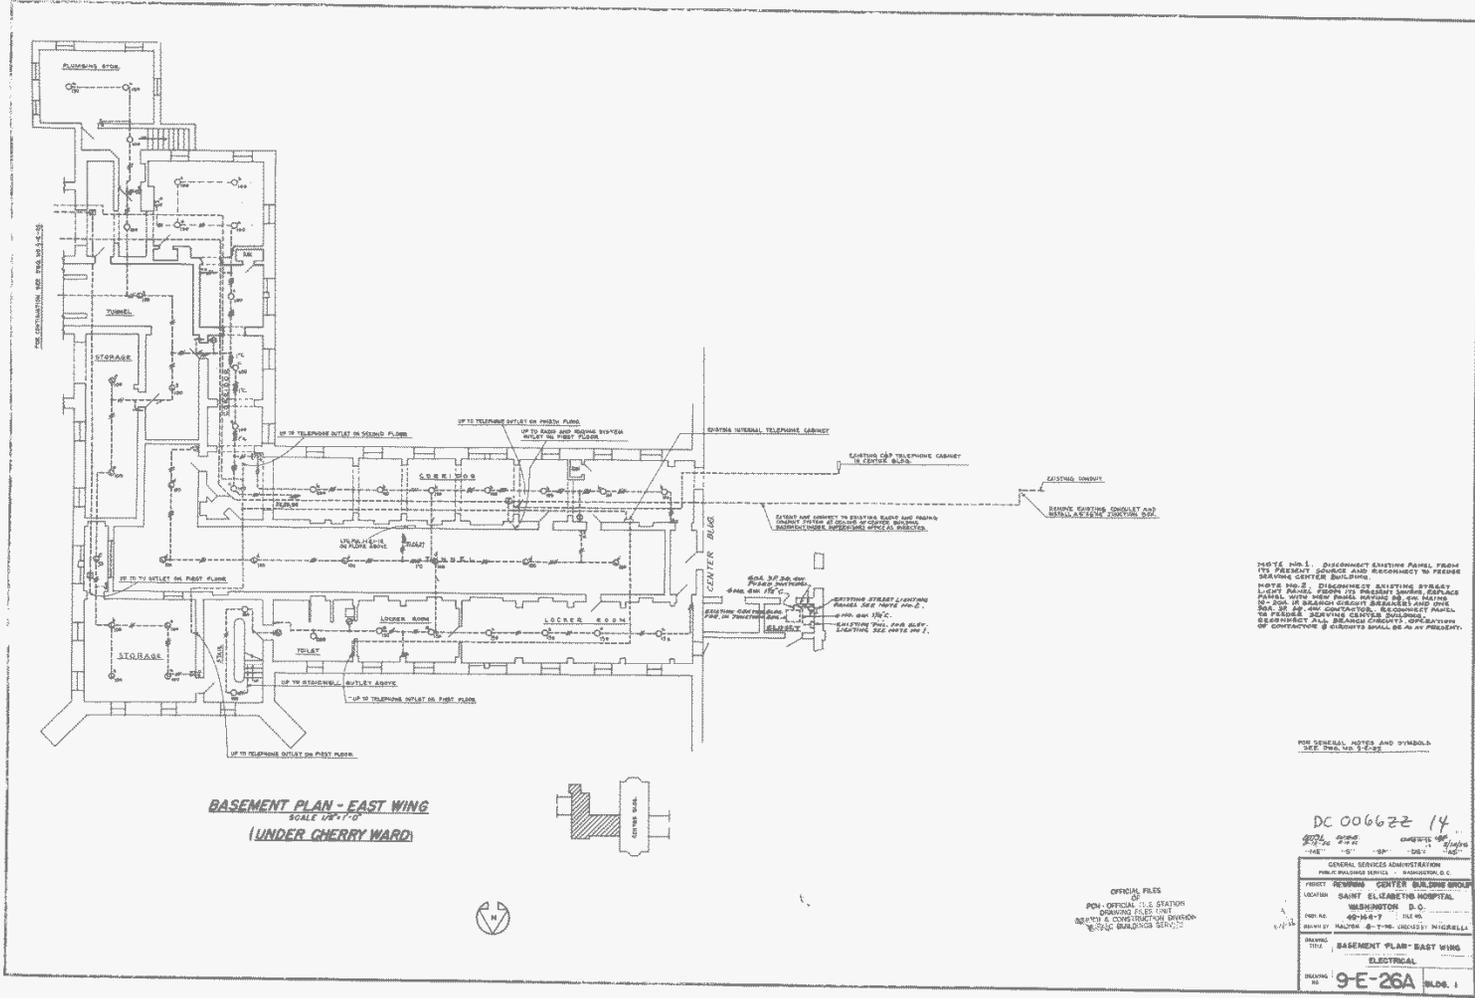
Basement plan of the east wing of the Center Building outlining improvements to the electrical system, 1953. Source: GSA archives, image DC0066SE0014.
